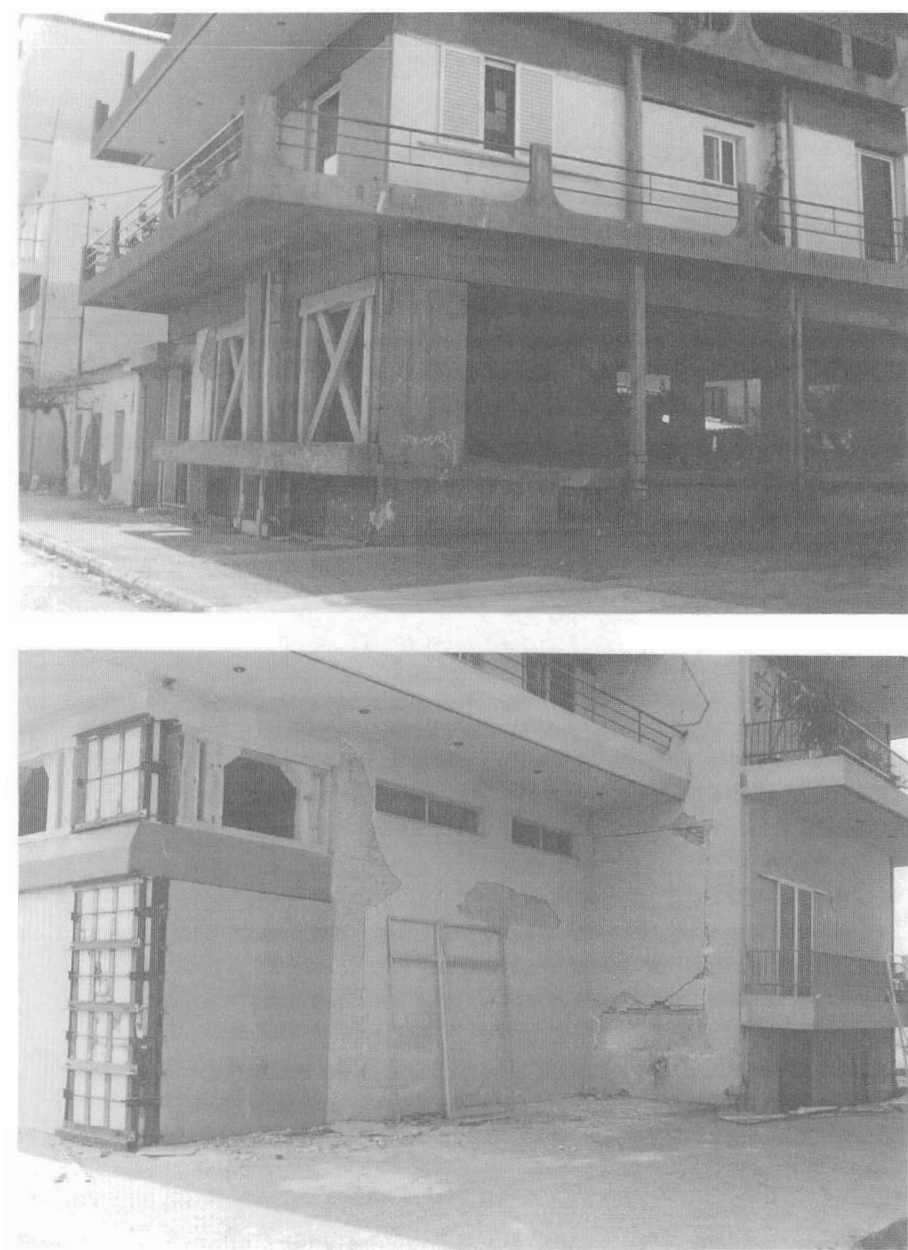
Damage at construction with reinforced concrete in Pyrgos.
